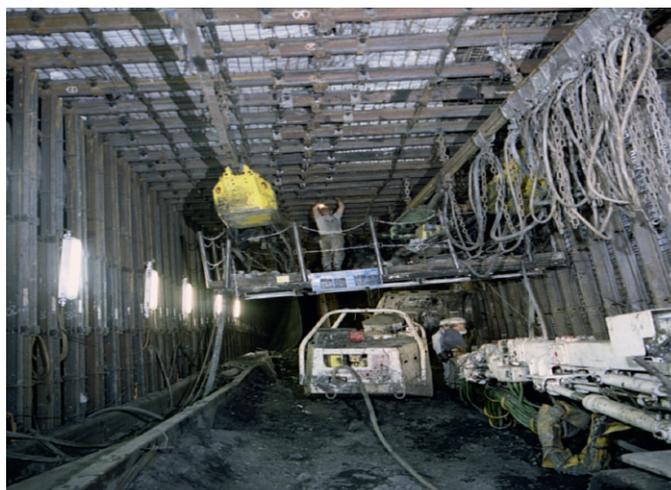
First stage of the start-up heading with a floor width of 7.2 m.
